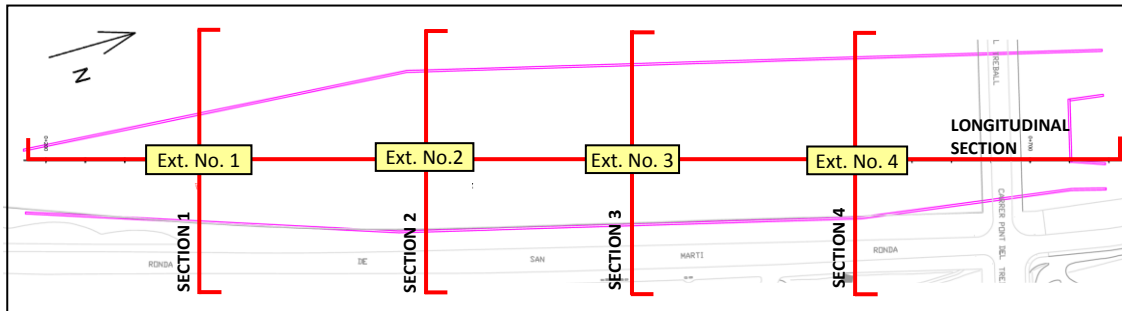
Plant with transversal cross-section and longitudinal cross-section.
